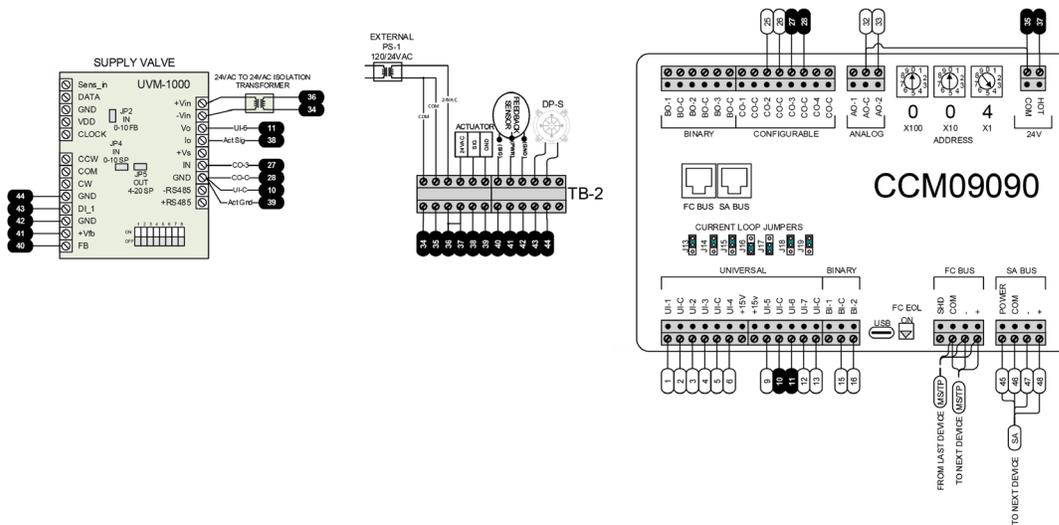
CCM EXHAUST VALVE SYSTEM
